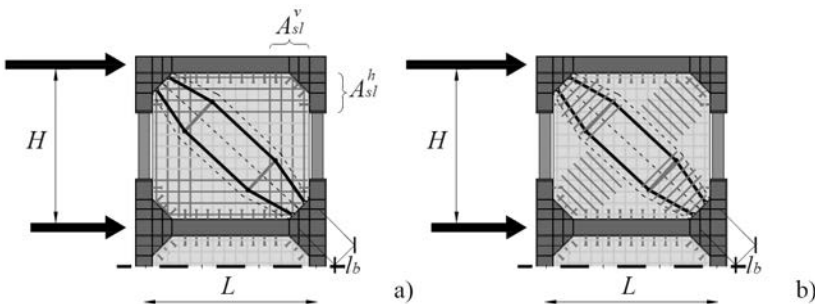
(a) reinforcements constituted by orthogonal rebar layout; (b) reinforcements constituted by additional stirrups.
